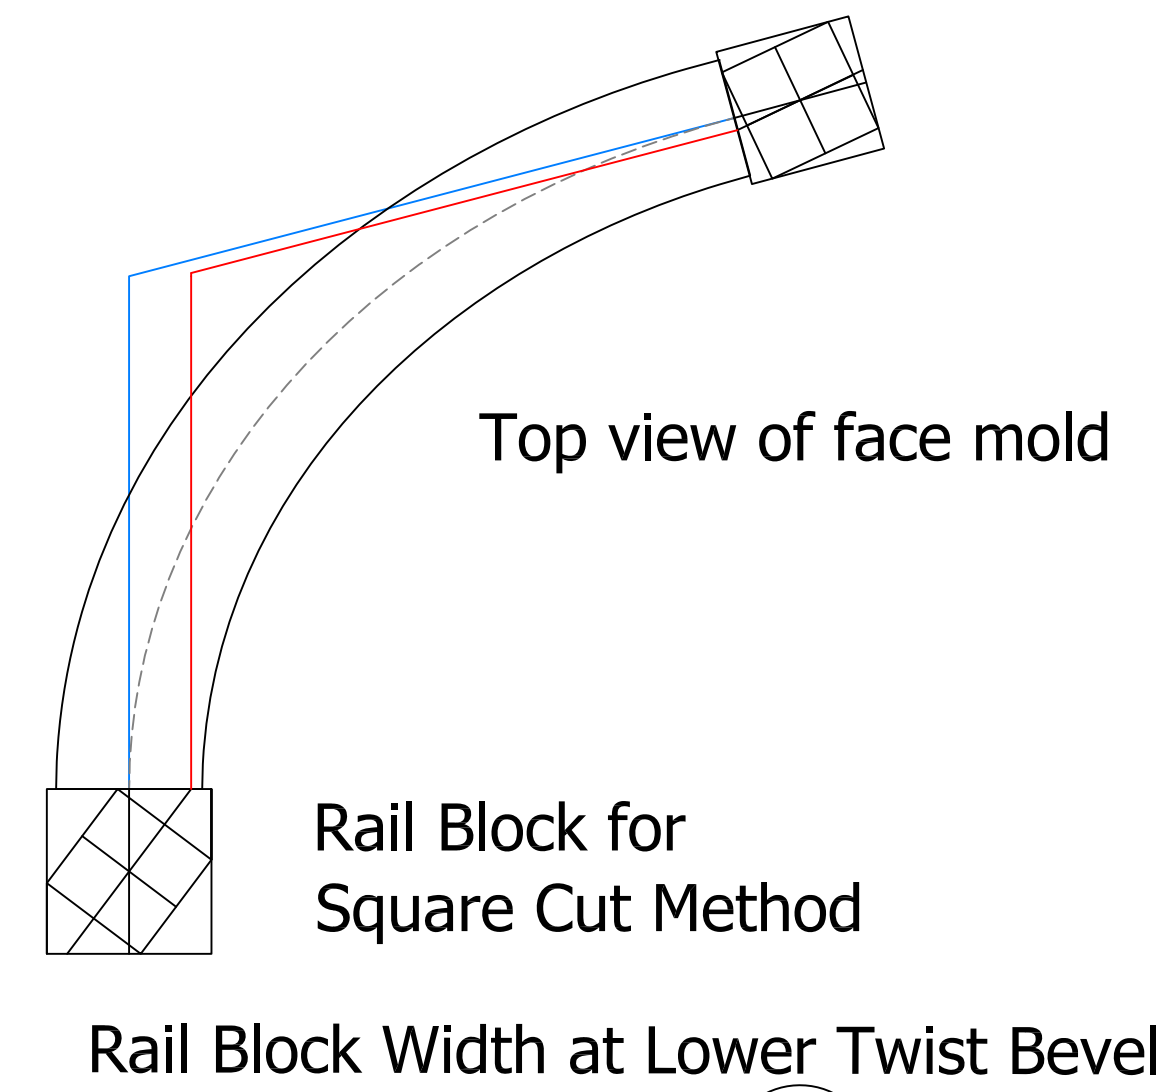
Obtuse Plan with Short Upper Pitched Tangent
